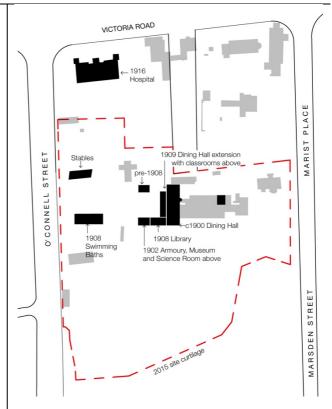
Plan showing phases of development, 1900 – 1920 Tonkin Zulaikha Greer Architects, adapted from 1994 Conservation Management Plan.
